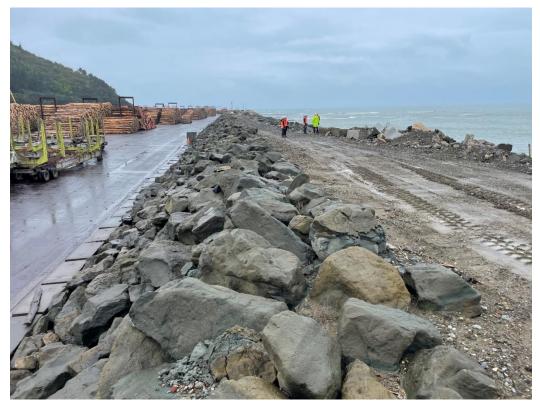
Inner riprap seawall that separates the logyard from the road and the outer seawall that will be deconstructed.
